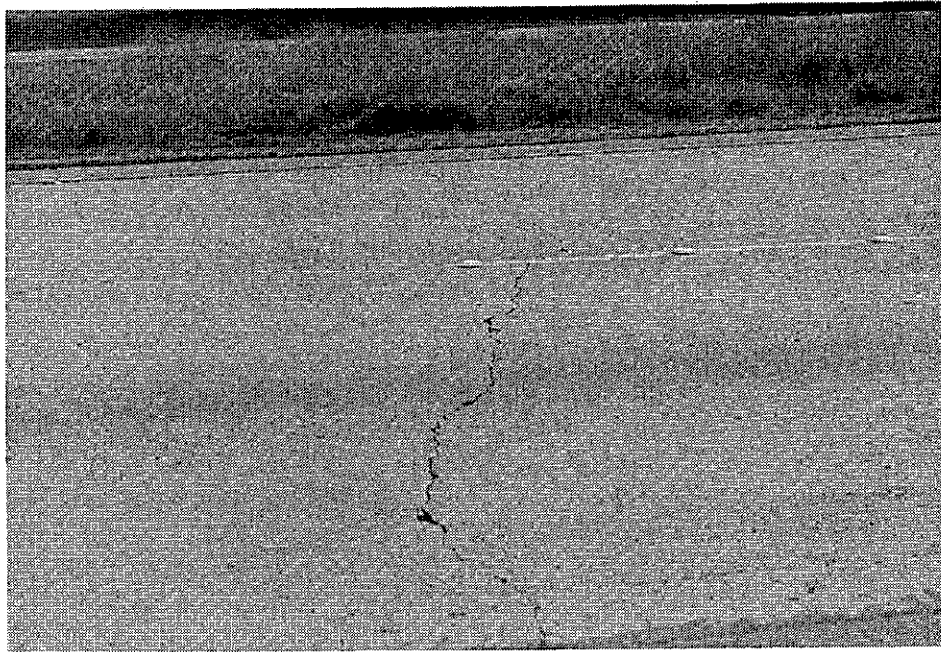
Typical cracking in section with longitudinal steel only, with steel placed below the center of pavement.
